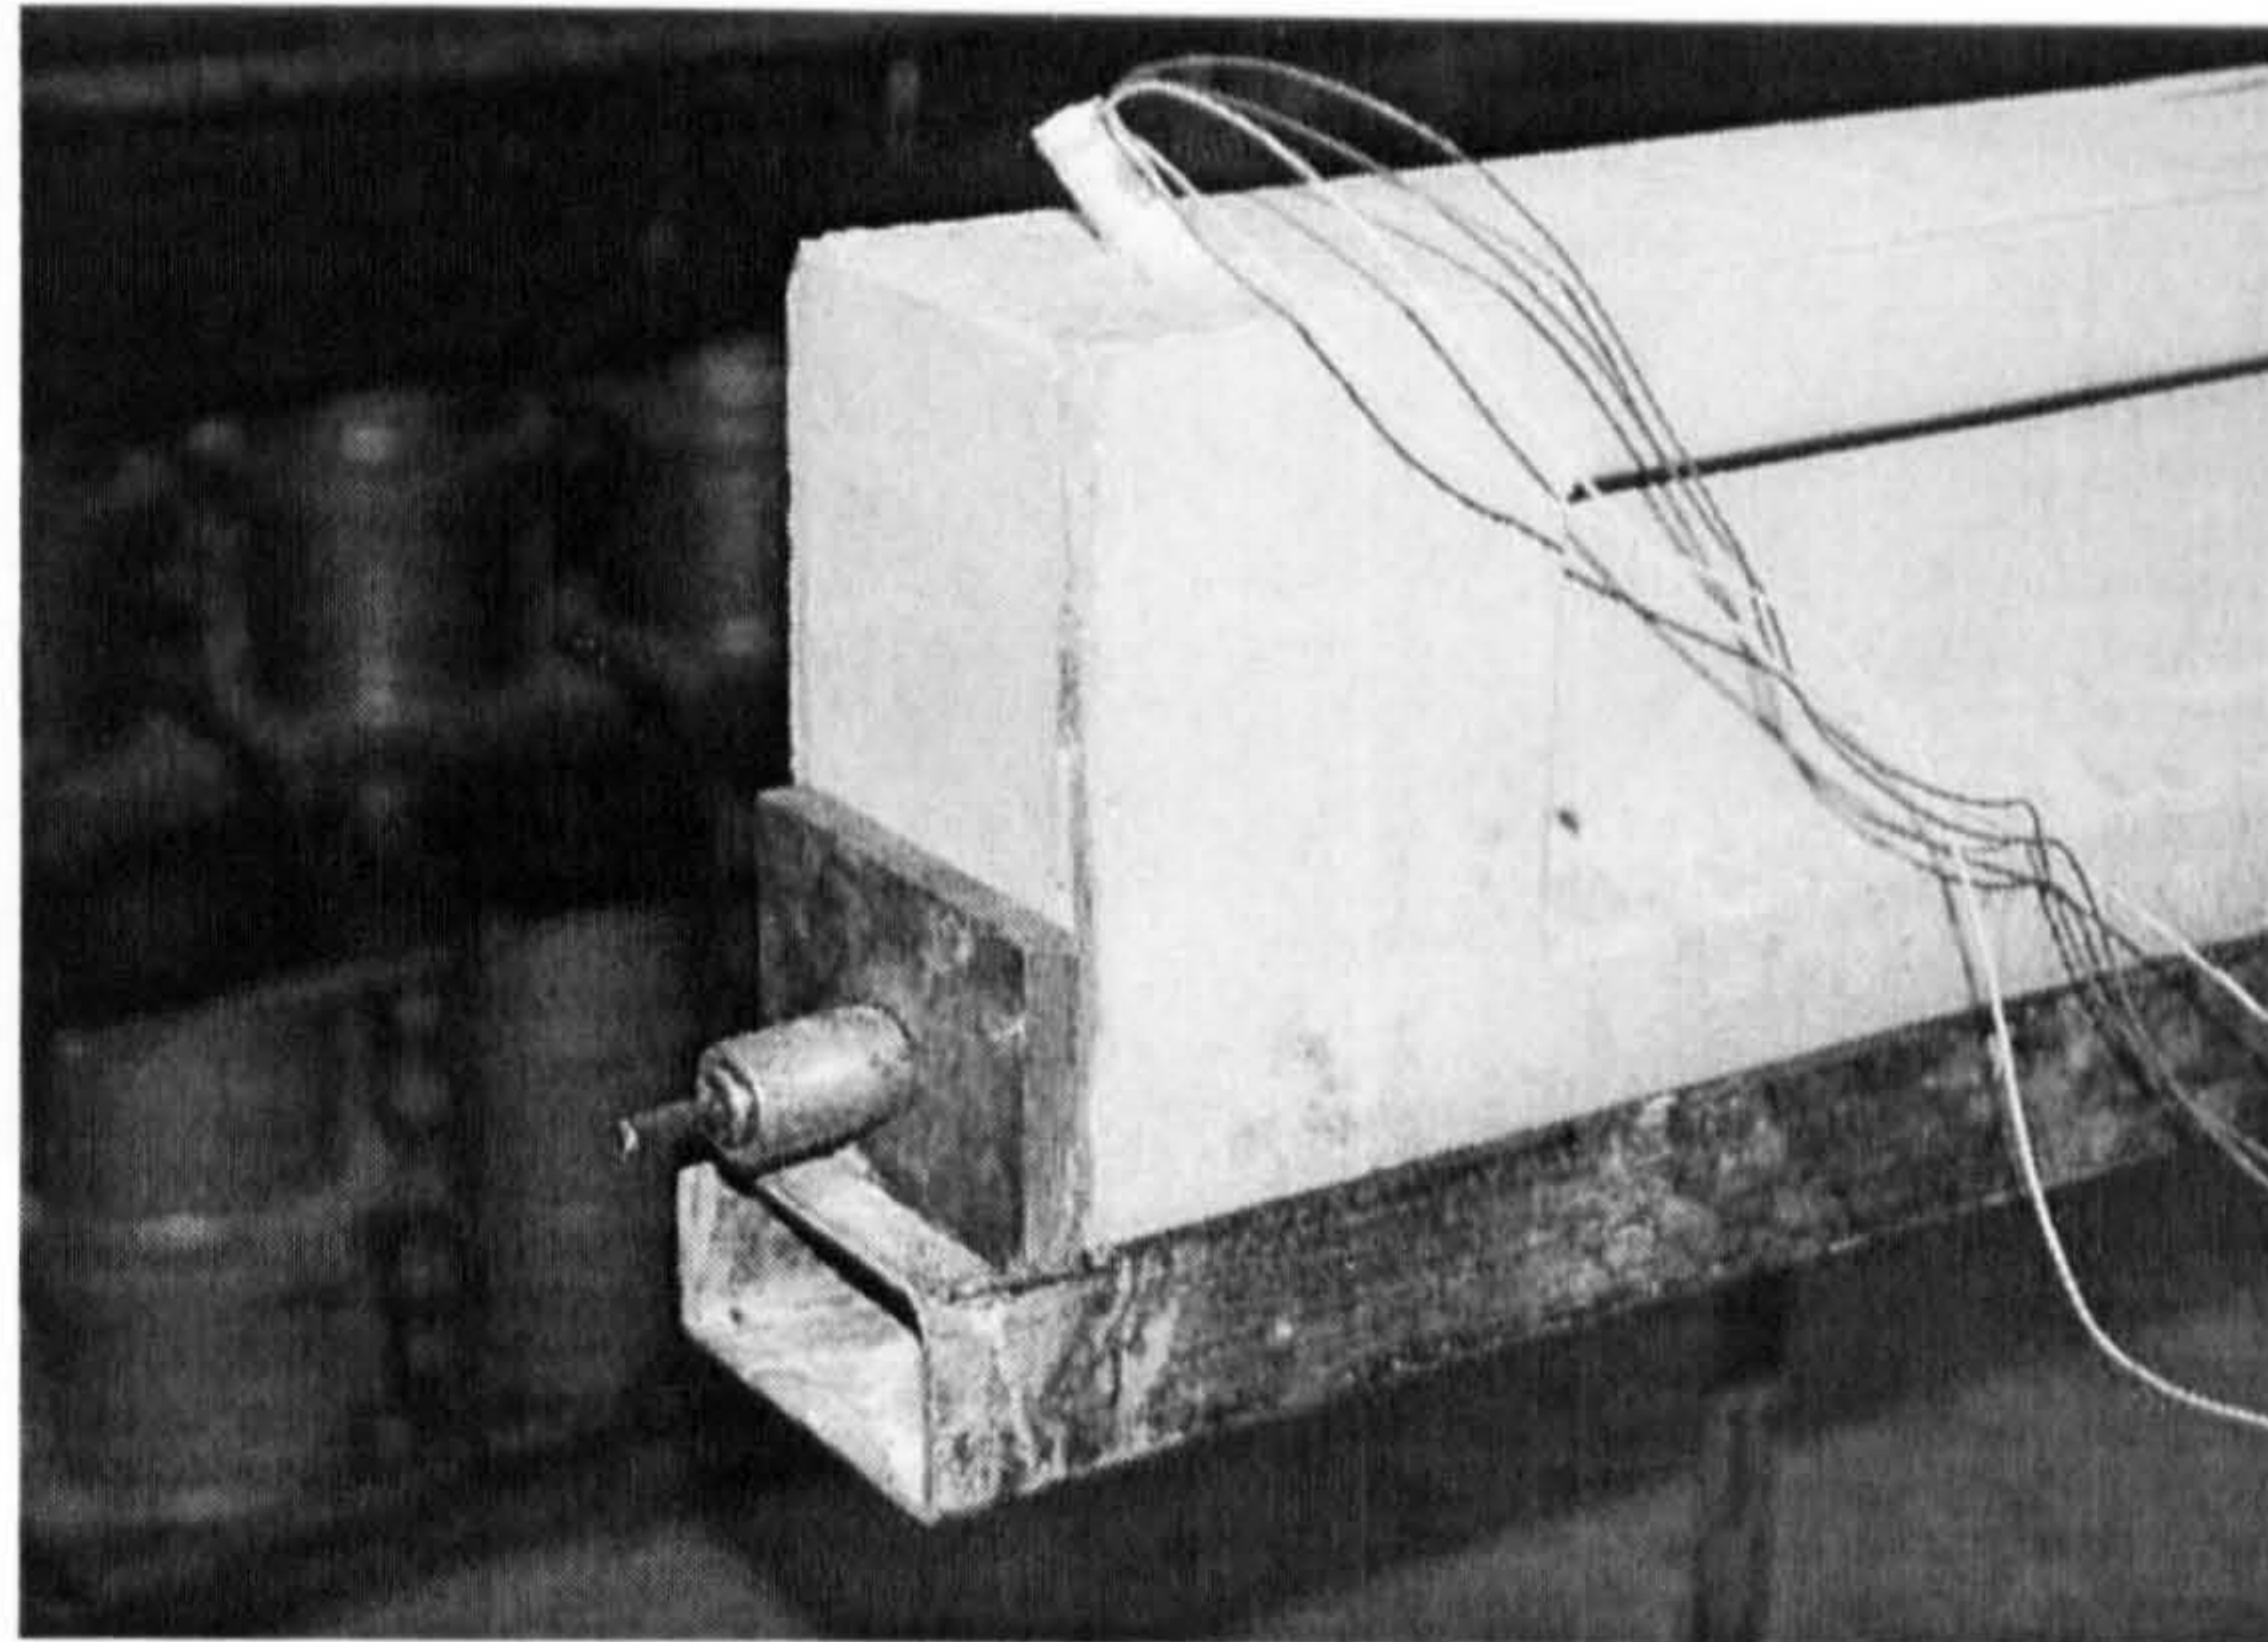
Anchor, end plate and grouting tube for internal prestressing process.
